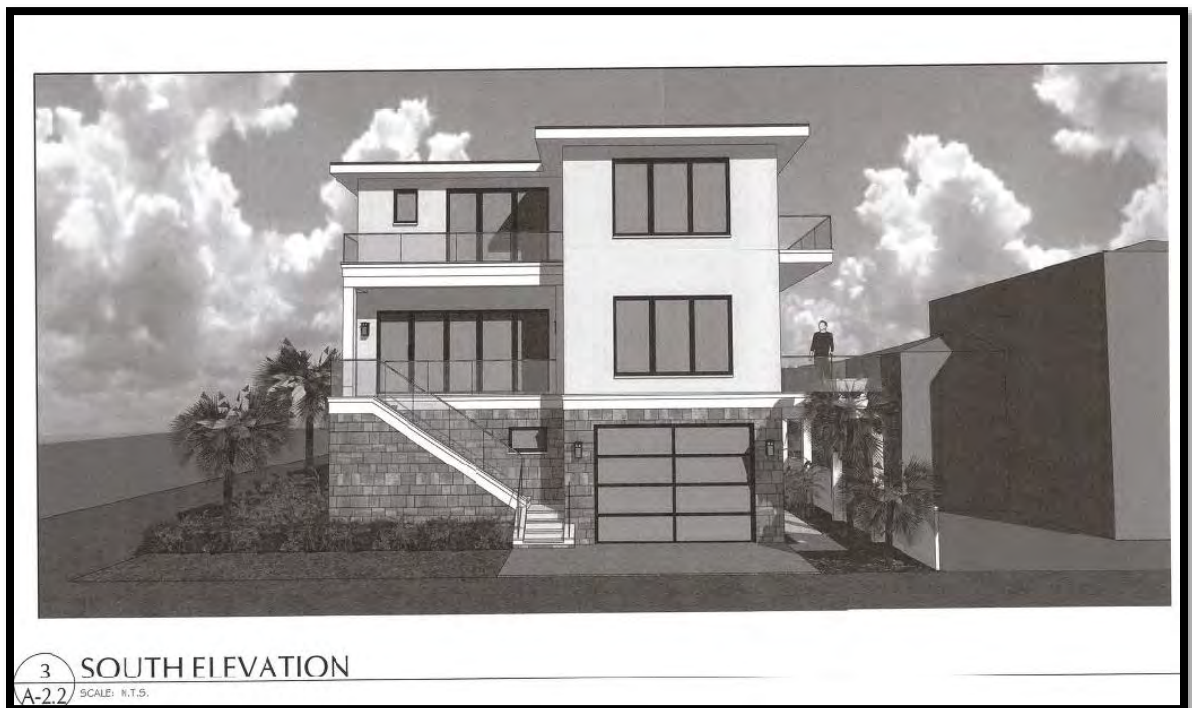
Proposed Frontage Elevation (Southern Elevation facing Orange St) 108 Orange St, Neptune Beach, FL
